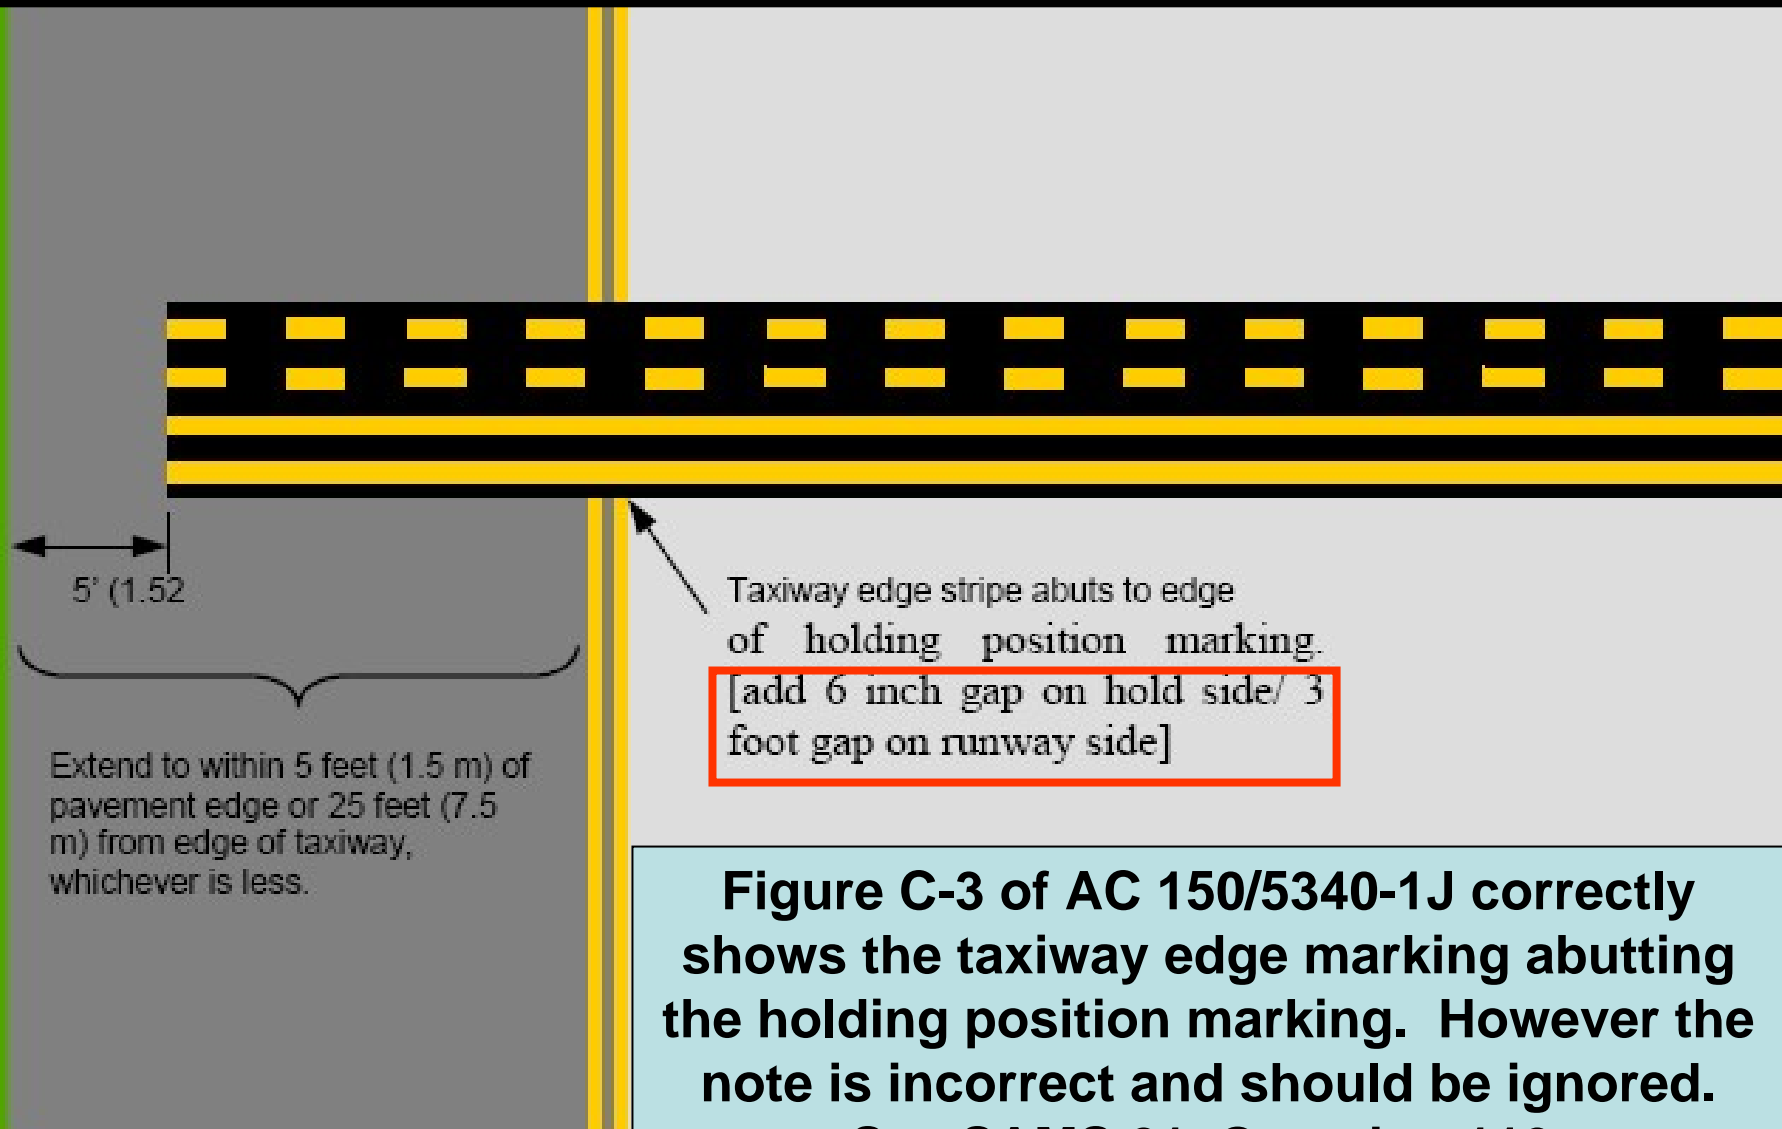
of AC 150/5340-1J correctly shows the taxiway edge marking abutting the holding position marking. However the note is incorrect and should be ignored. See SAMS 21, Question 110.
